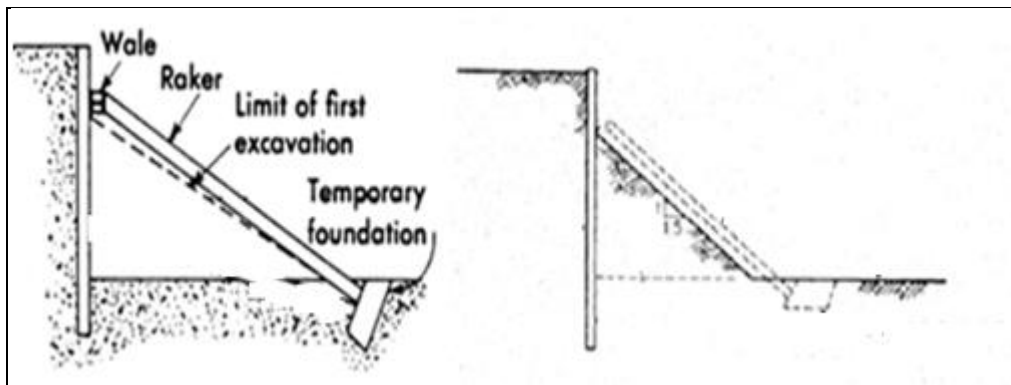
Schematic braced (rakers) cantilever wall in long span excavation [10]
